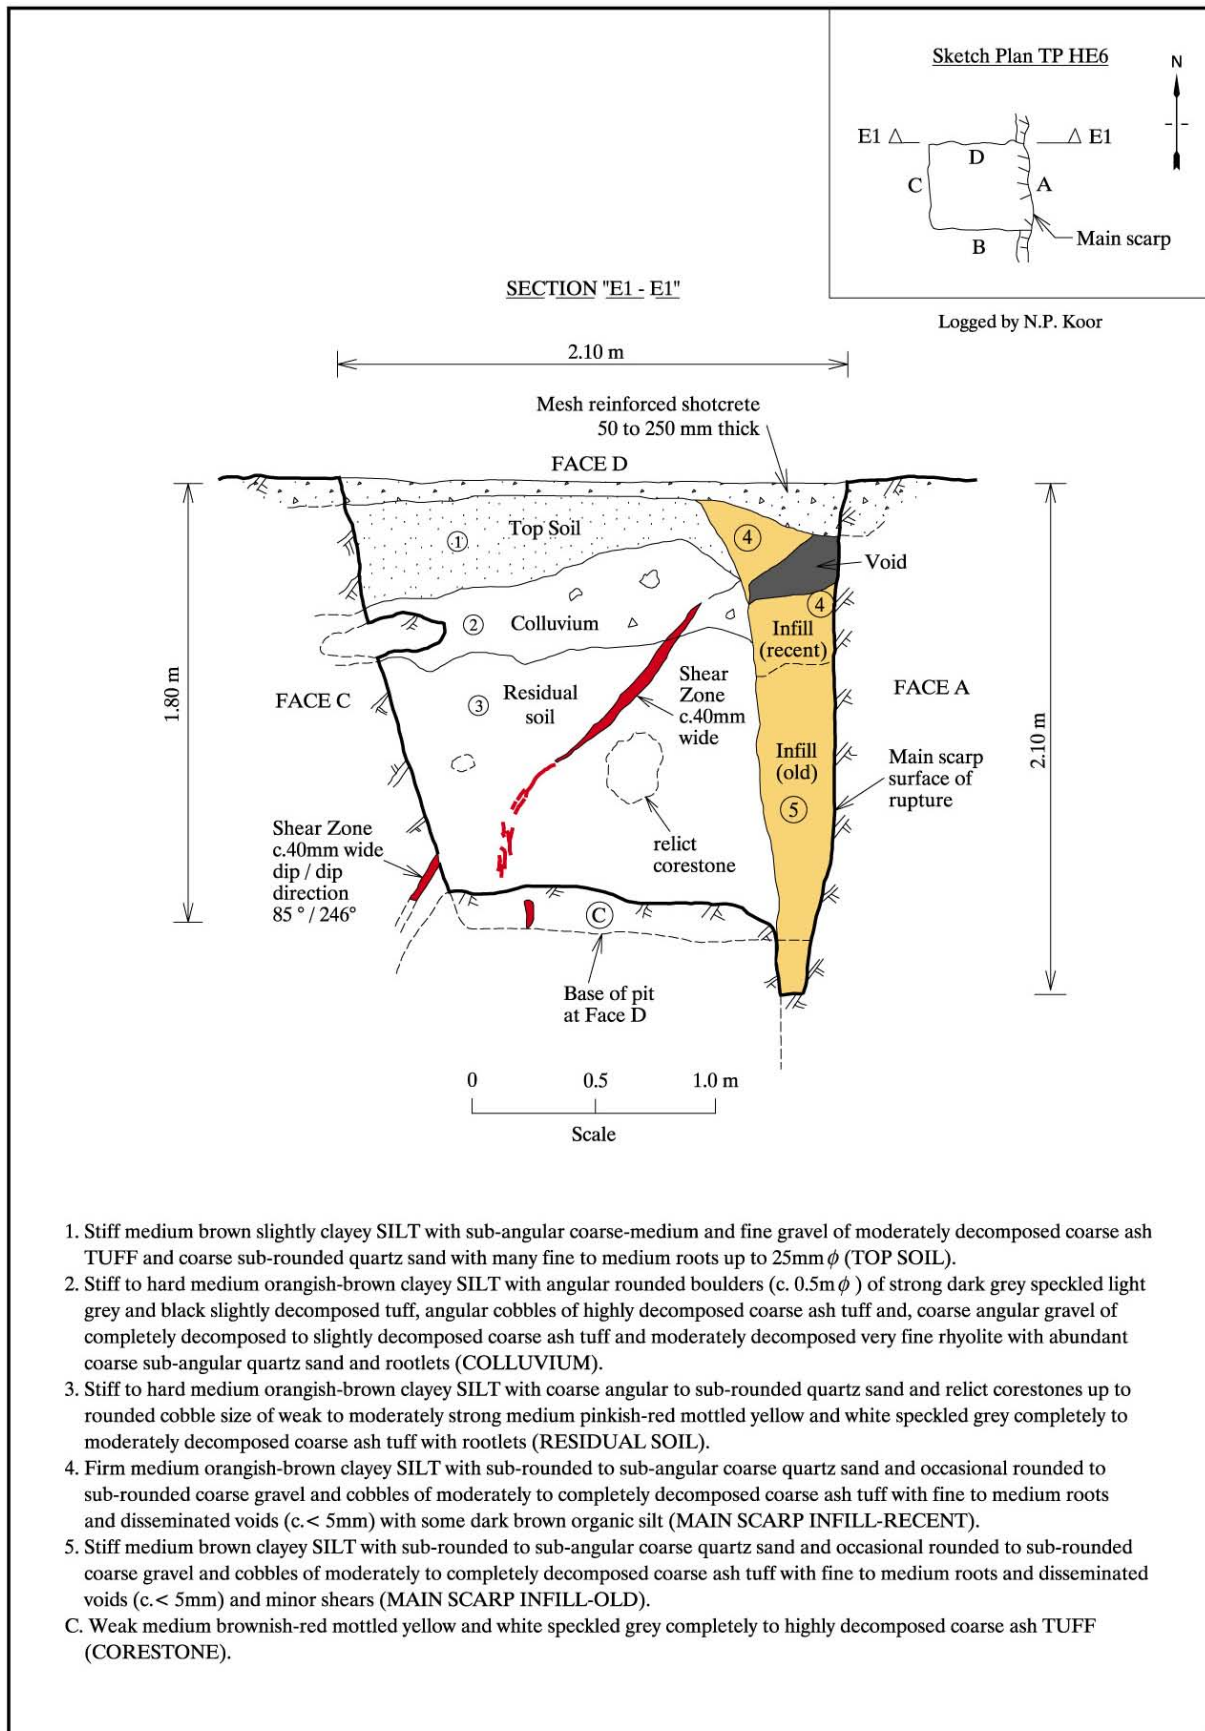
Lai Ping Road Land Investigation Trial Pit HE6 - Section "E1 - E1"
